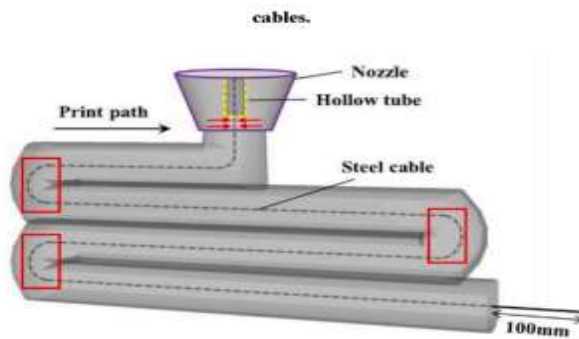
Schematic diagram of steel cable reinforcement printing process (red wireframe shows anchoring formed by steel cable at turning and climbing). [13]
